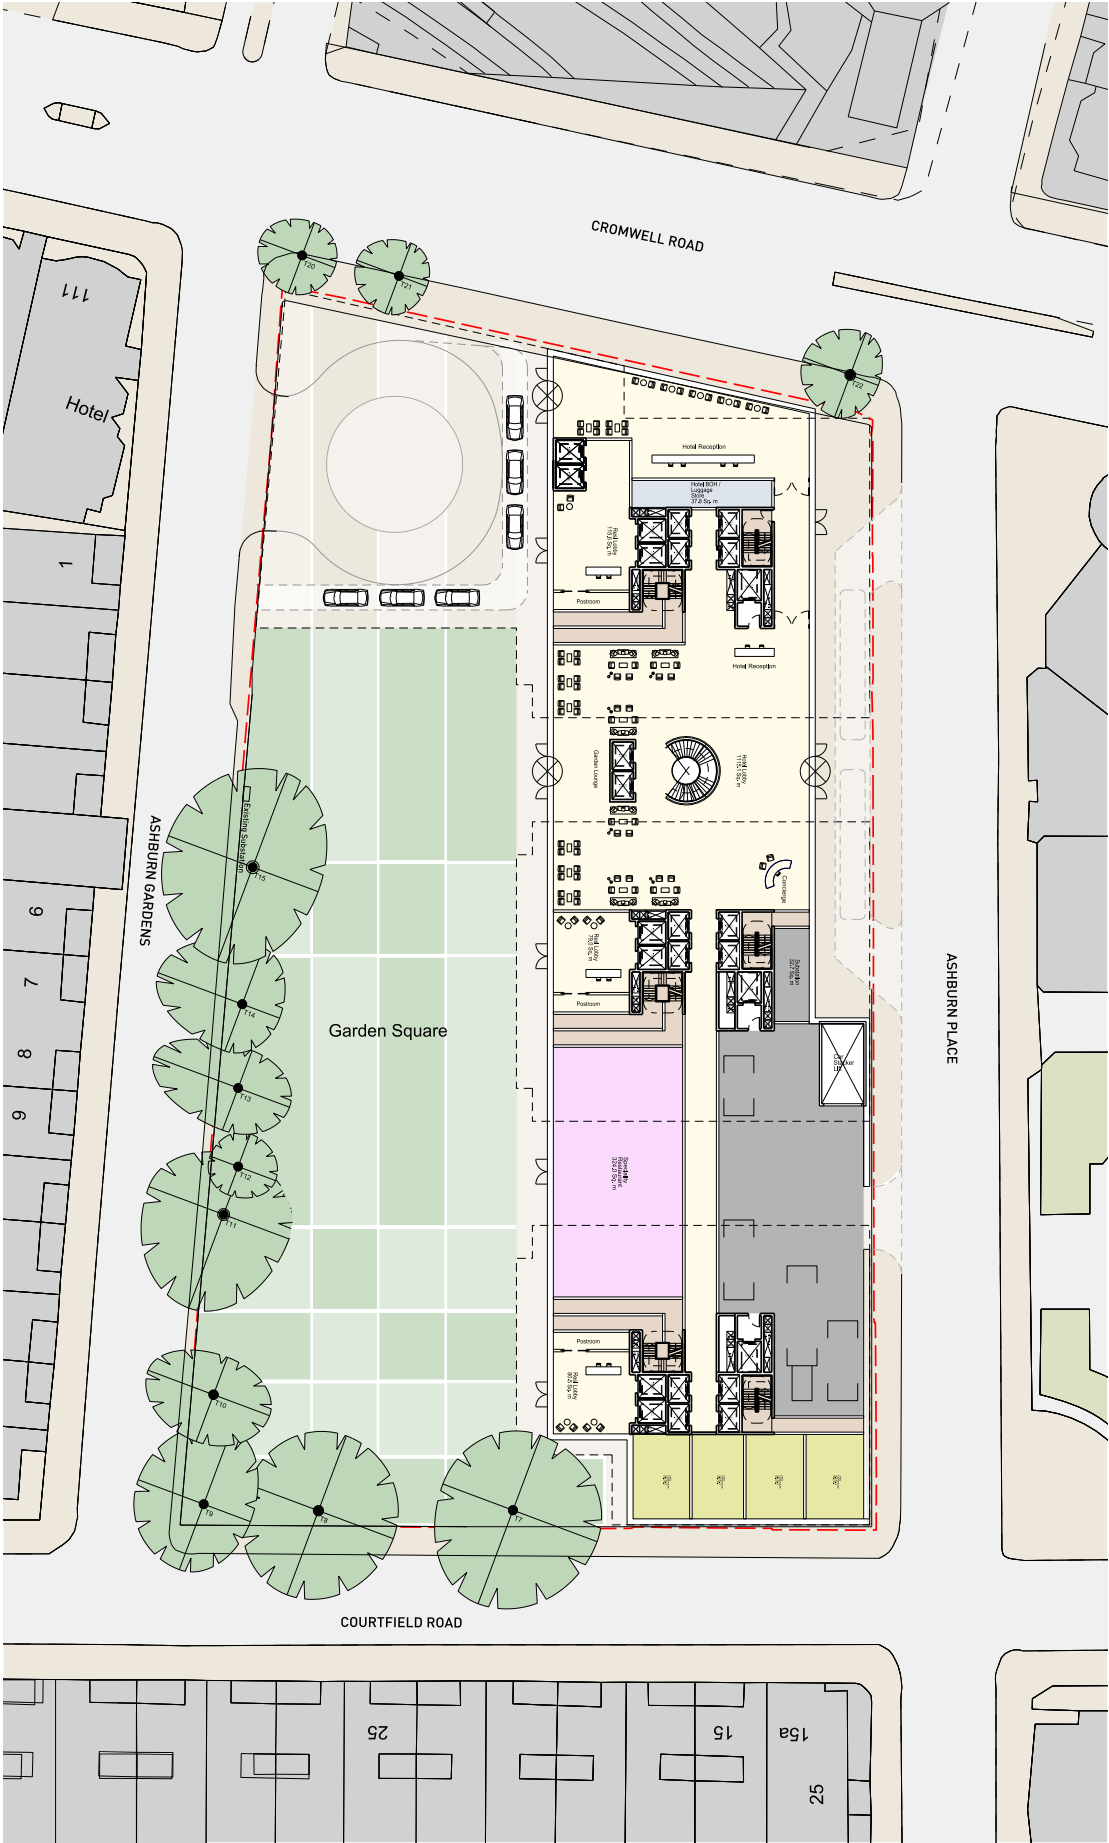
Ground floor plan illustrating the drop-off in the north west corner of the site
